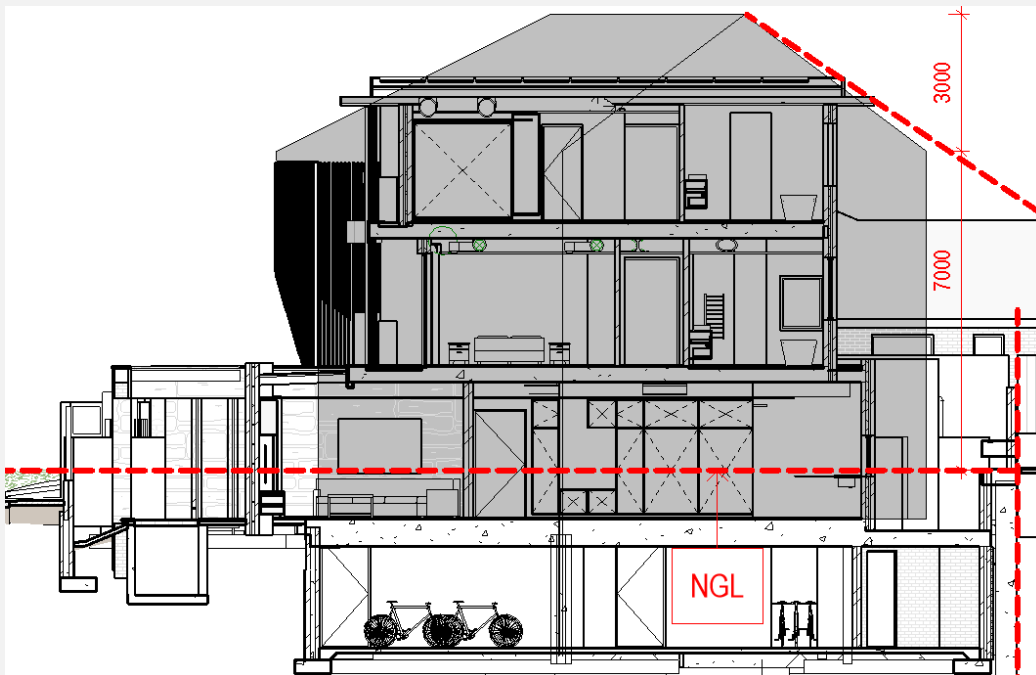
Grey shading indicates a pitched roof design over a 7m wall plate.
